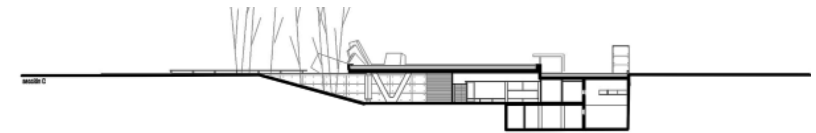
Section showing the procession as one enters the space at a level lower than the ground floor. As in the plan the concept is visible in the articulation of the section (archdaily.com).
